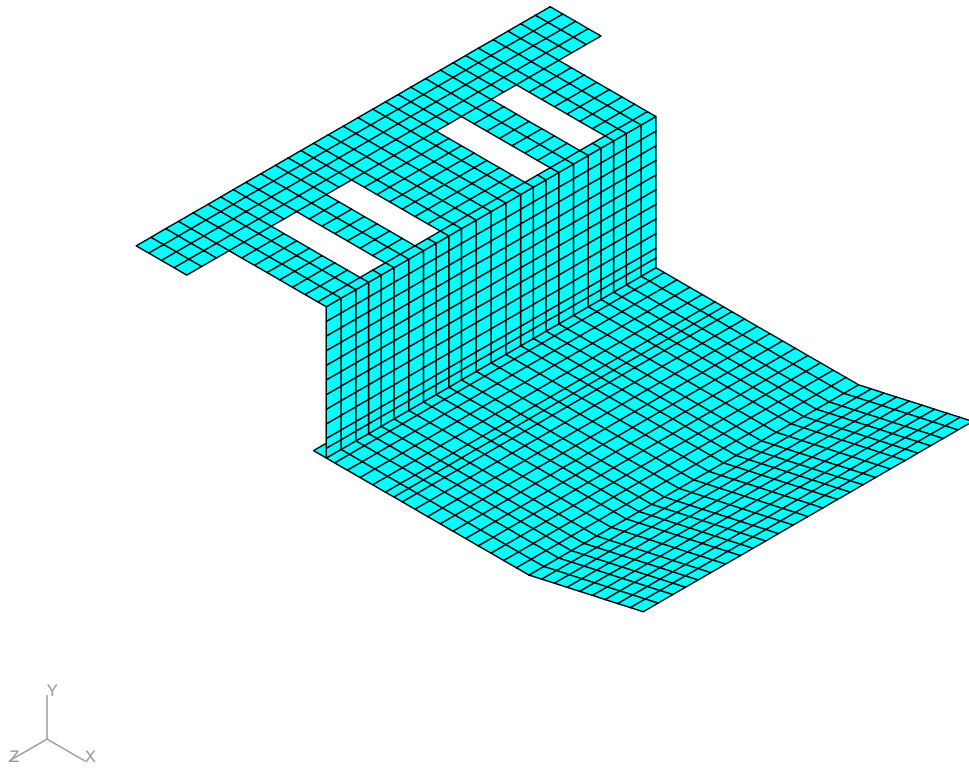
{Isometric View of ESWEMS Pumphouse GT Strudl Finite Element Model - Exterior Wall, Roof and Apron}
